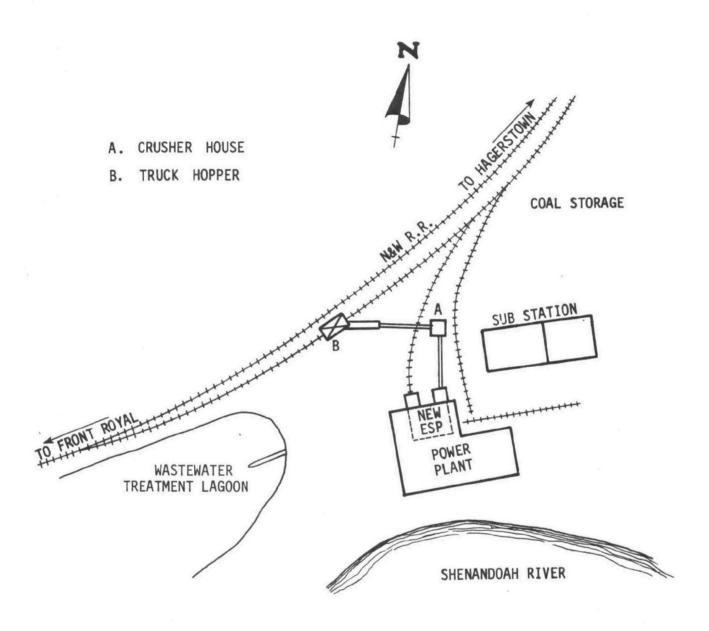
Site plan showing possible location of a new ESP for Boiler 1 at the Riverton power plant.
